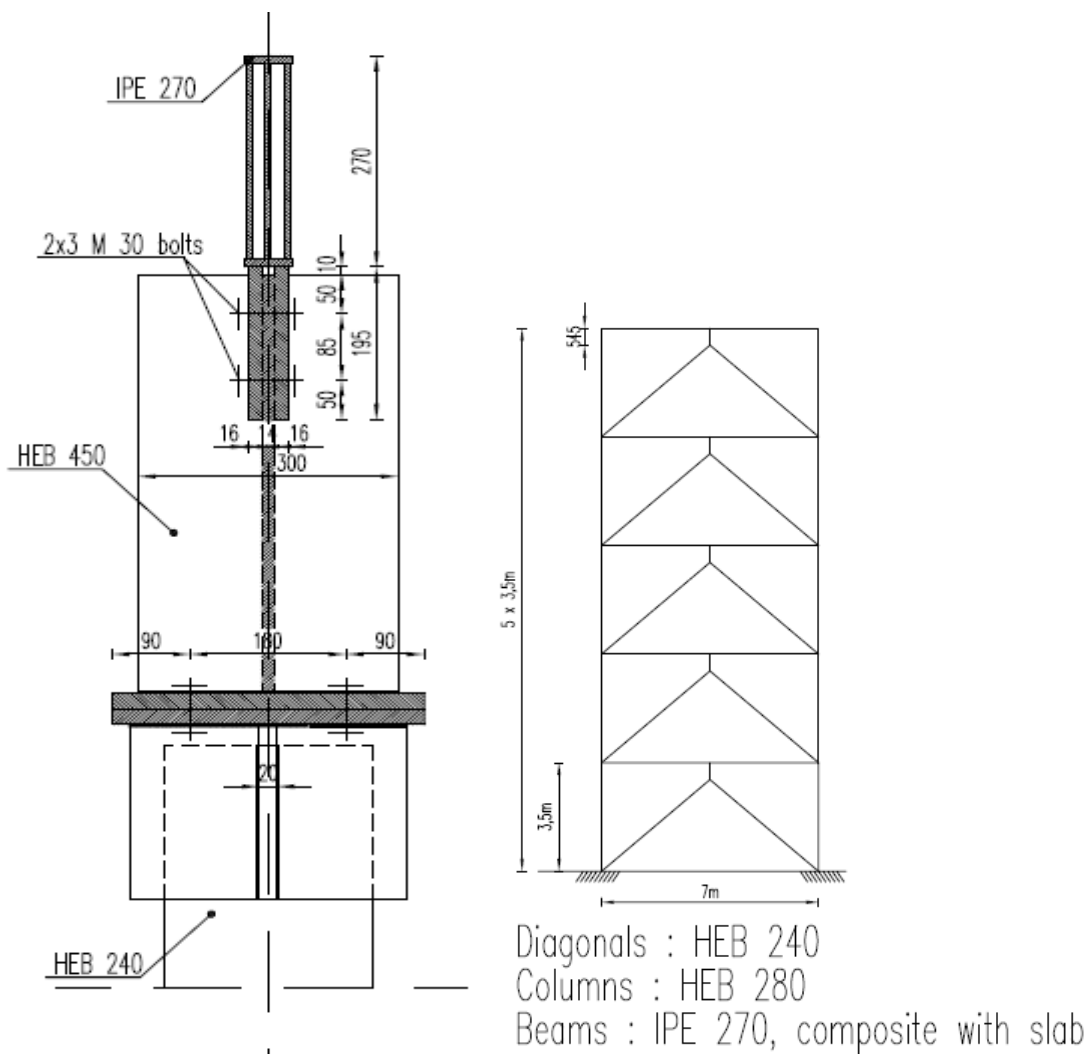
Section AA. Elevation view of connection. General view of EBF.
